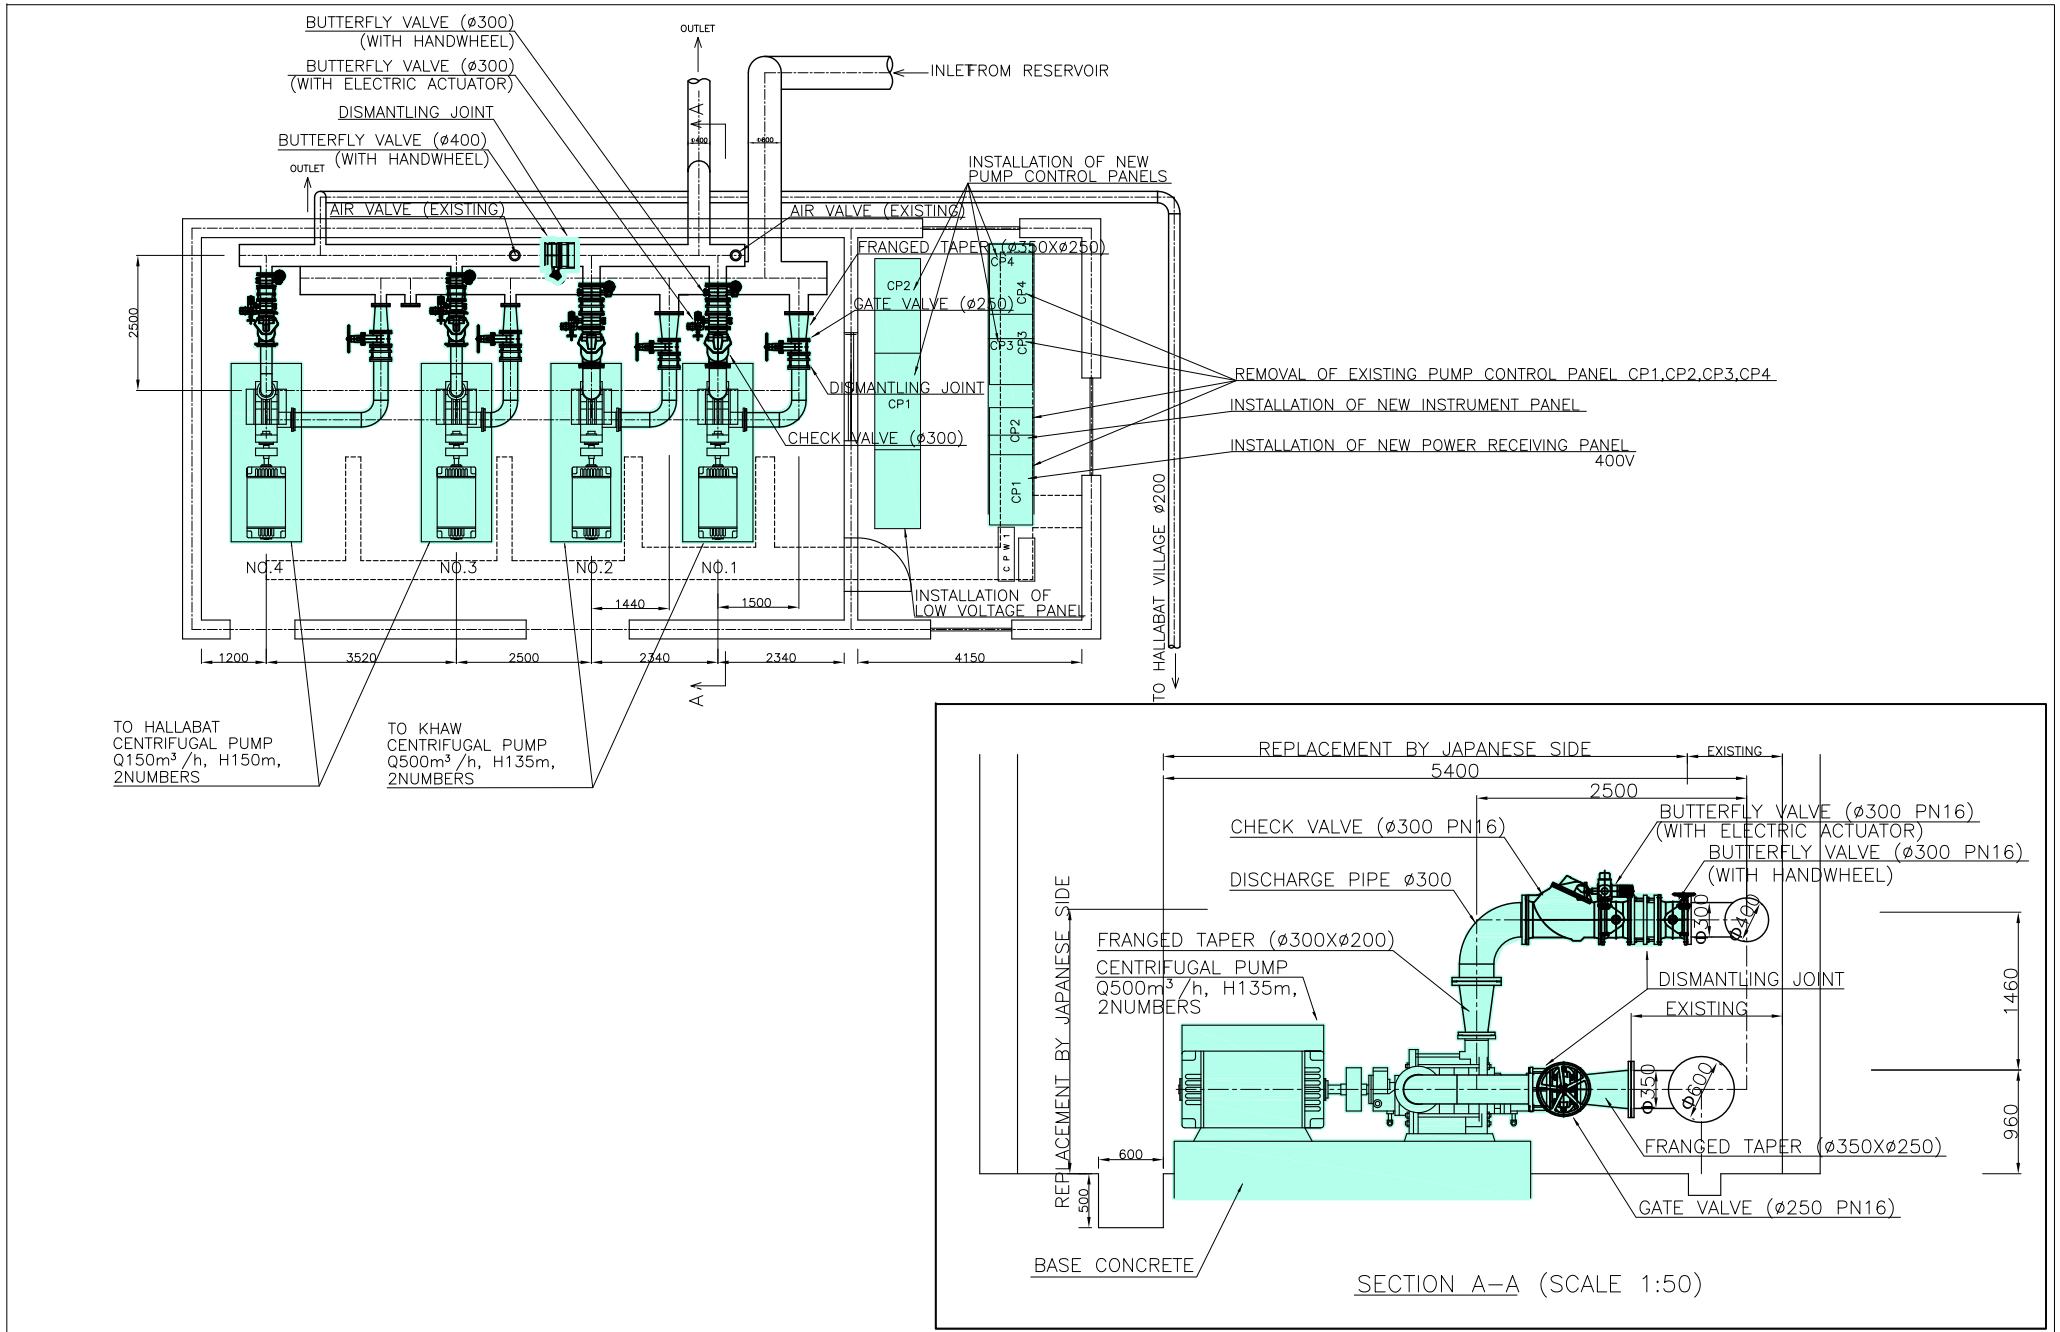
Installation Plan of Pumping Equipment for Hallabat Pumping Station
